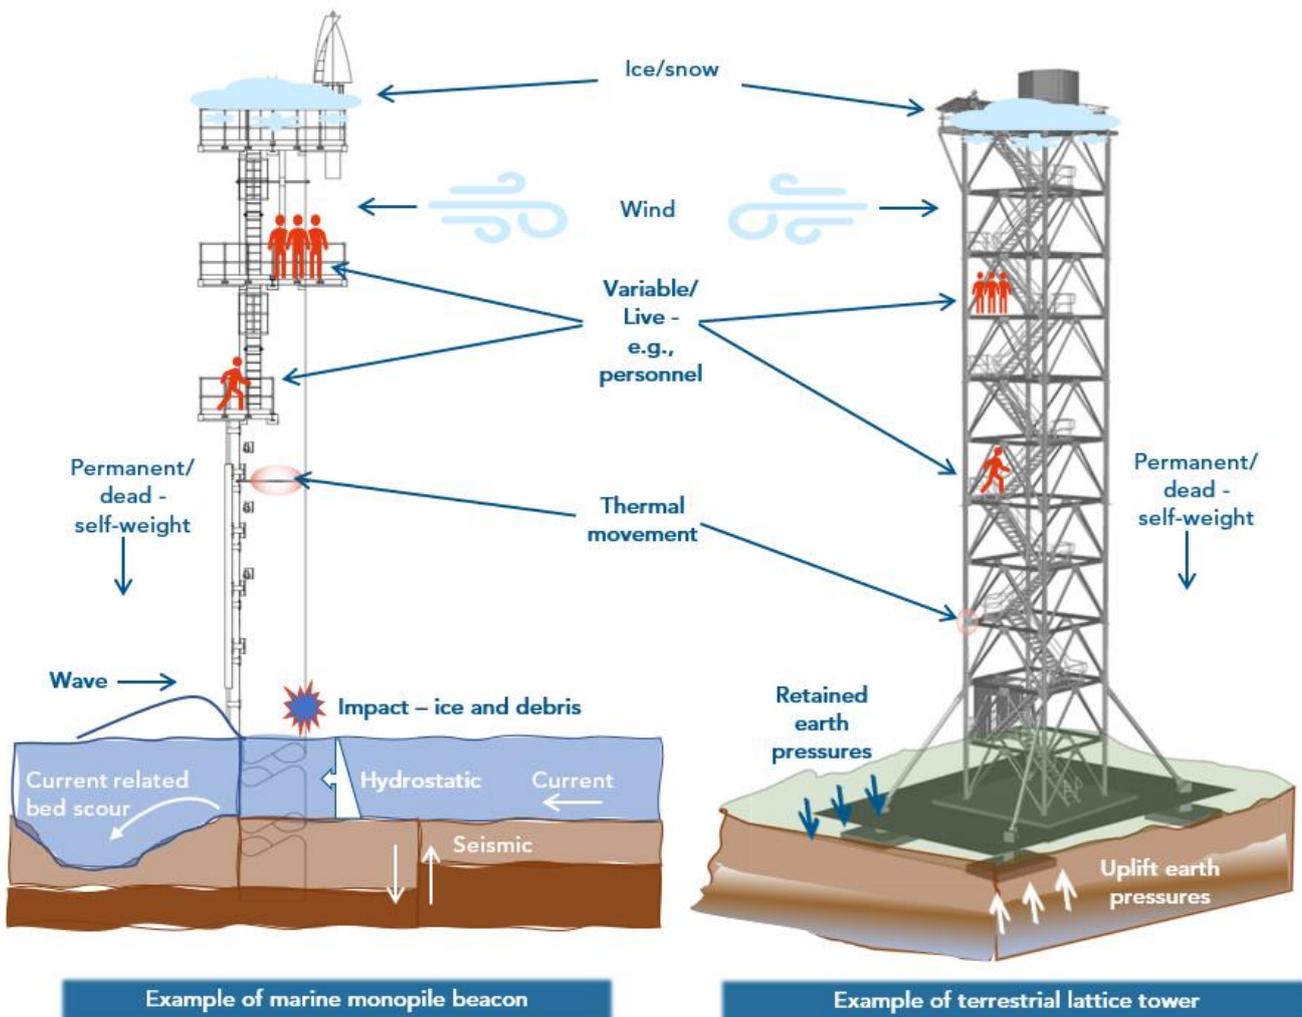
Examples of loads to be considered in AtoN design - marine monopile beacon and terrestrial lattice light tower
